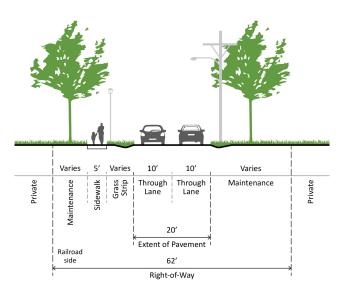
Proposed Typical Street Section for Barnesville Road from the MARC Platform to the Post Office
